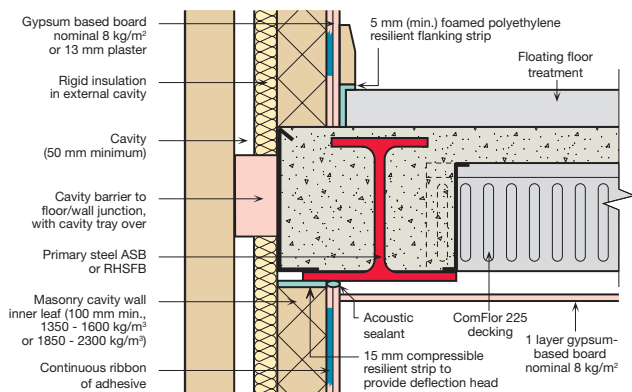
Acoustic detailing at junction between floor and external wall with ASB edge
